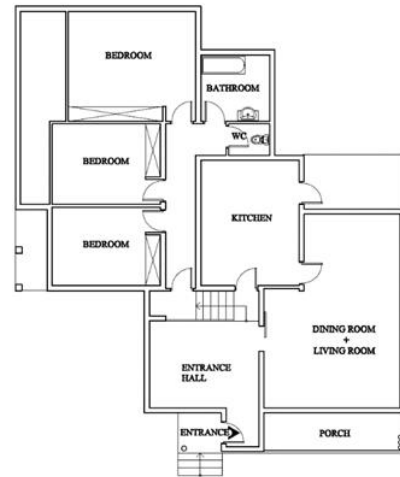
A Plan schema of a modern house in Güzelyurt (Authors, 2021).
